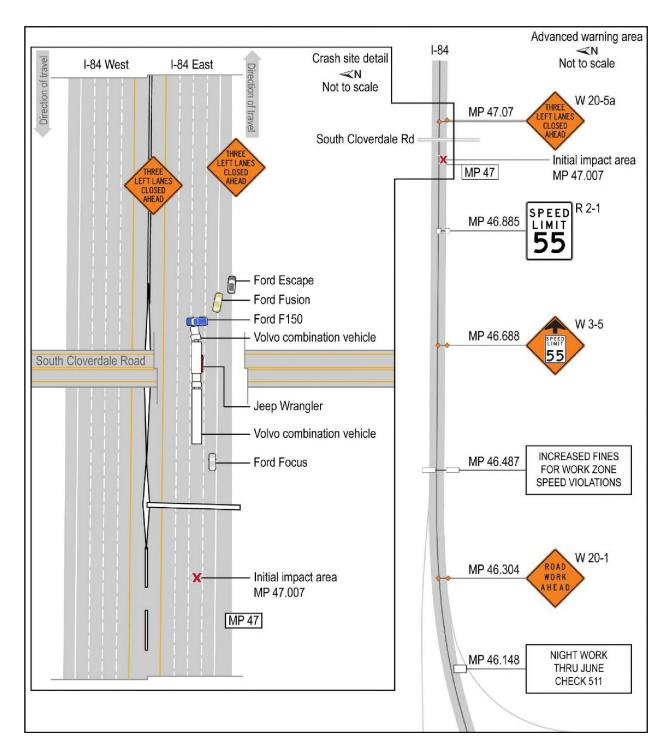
Advance Warning Area of Work Zone with Crash Site Detail
